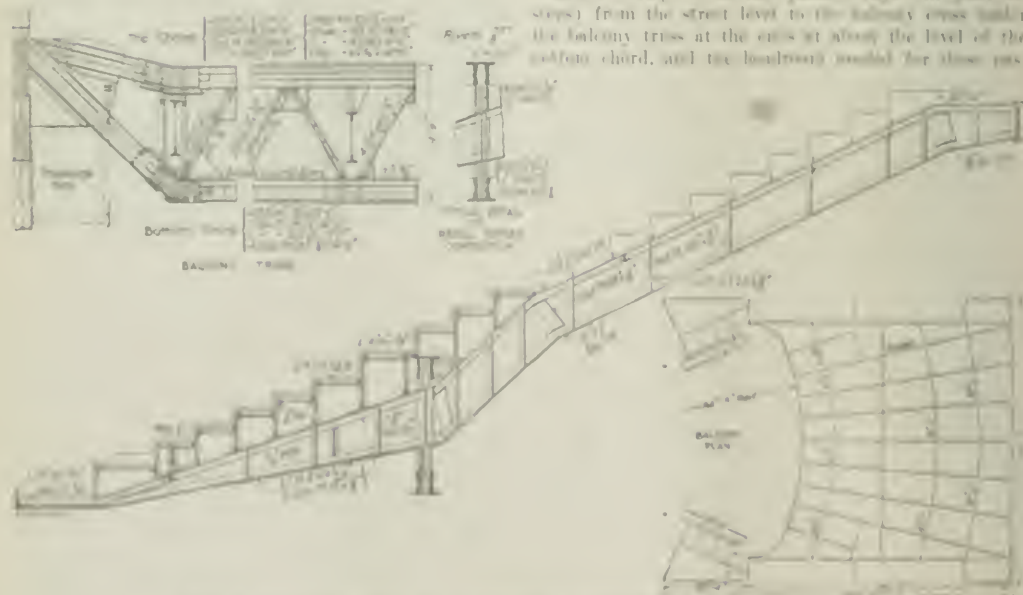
BALCONY TRUSS AND CANTILEVER GIRDER OF MCBRIDE THEATER
